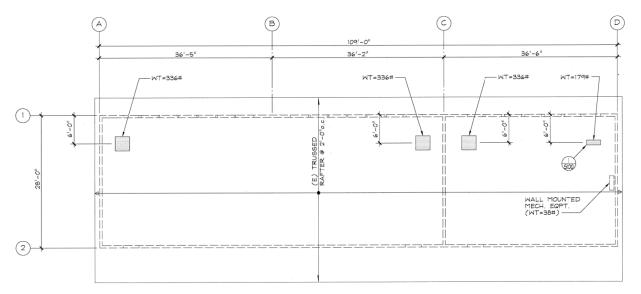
BUILDING 9: 2017 HVAC Upgrade Roof Framing Plan
